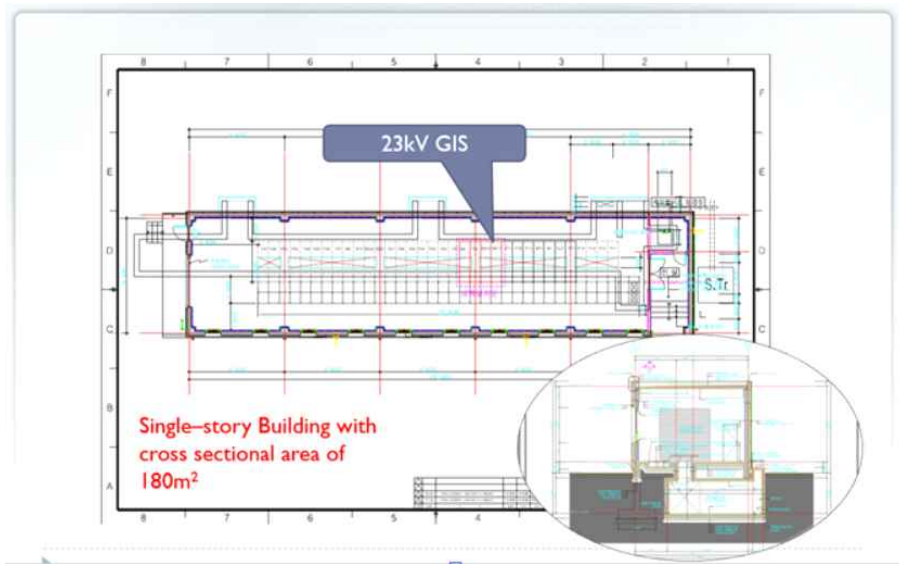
Simplified layout of a 23 kV switching station with single story building on the cross sectional area of 180 m<sup>2</sup>
